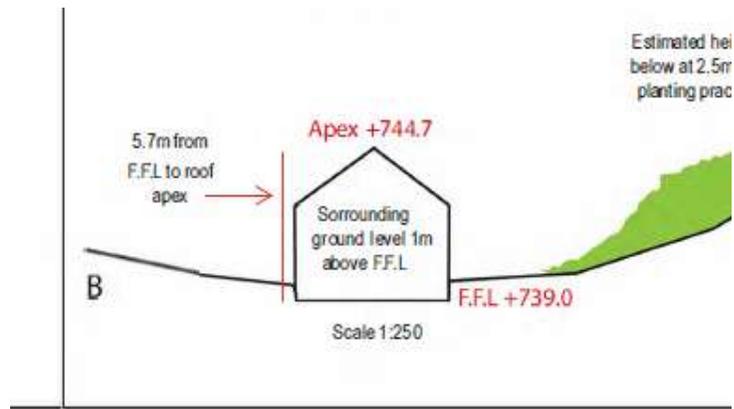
Snip of Wintergardens building height from Baxter Design Group Plans
